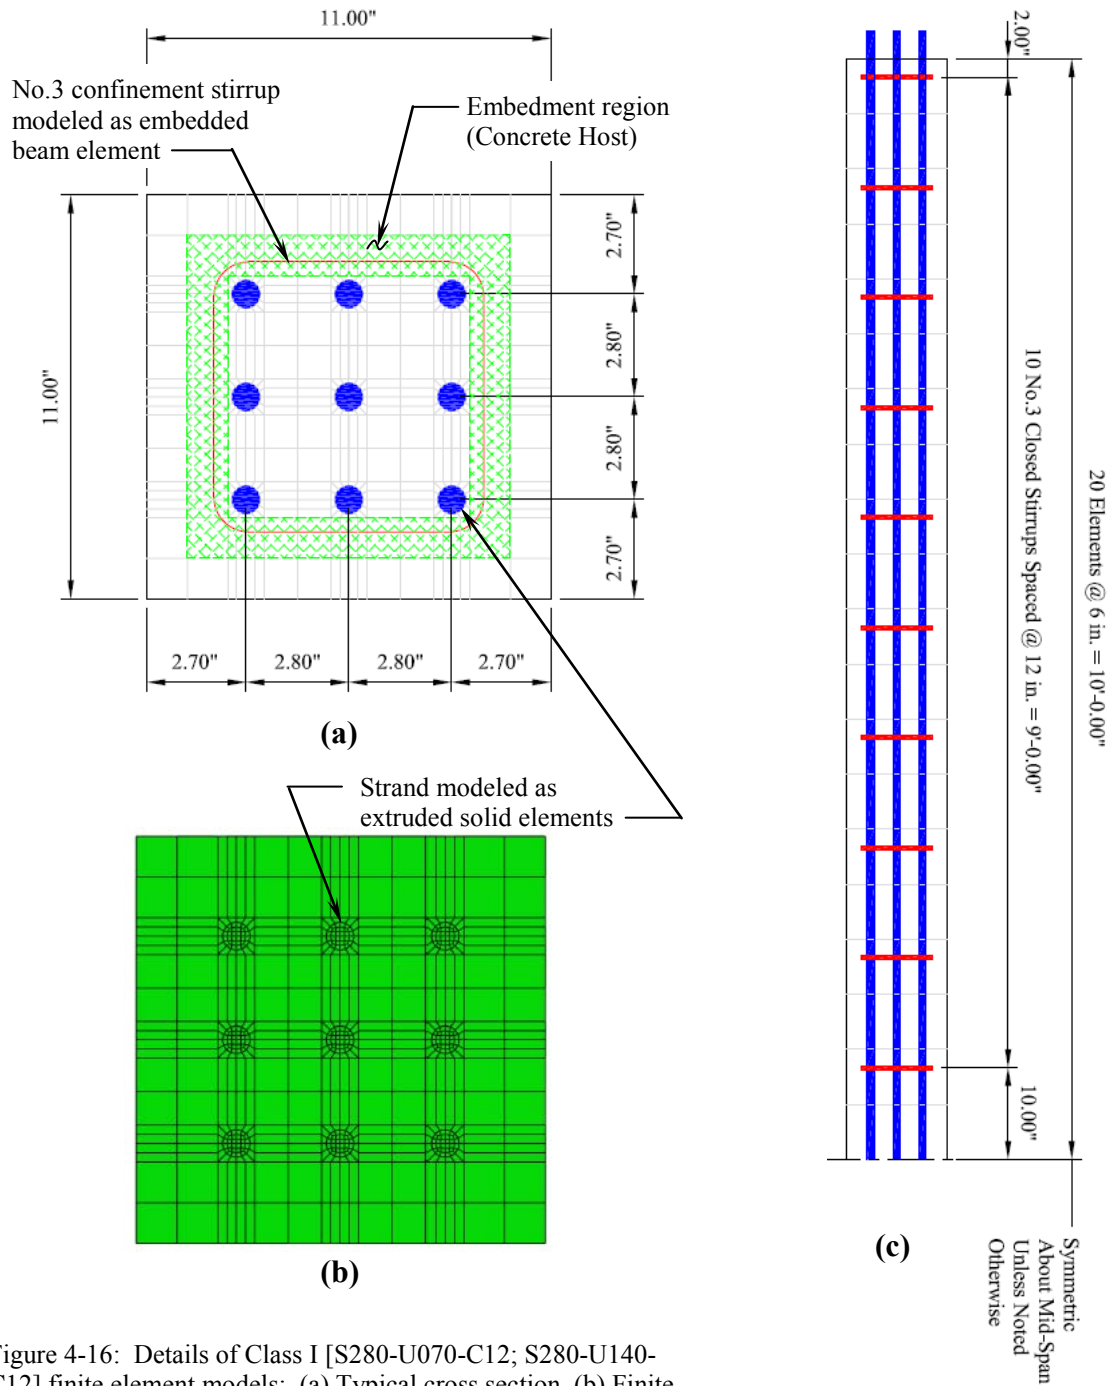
Details of Class I [S280-U070-C12; S280-U140-C12] finite element models: (a) Typical cross section, (b) Finite element simulation, and (c) Layout of confinement reinforcement (No.3 closed stirrups spaced at 12 in. on center)
